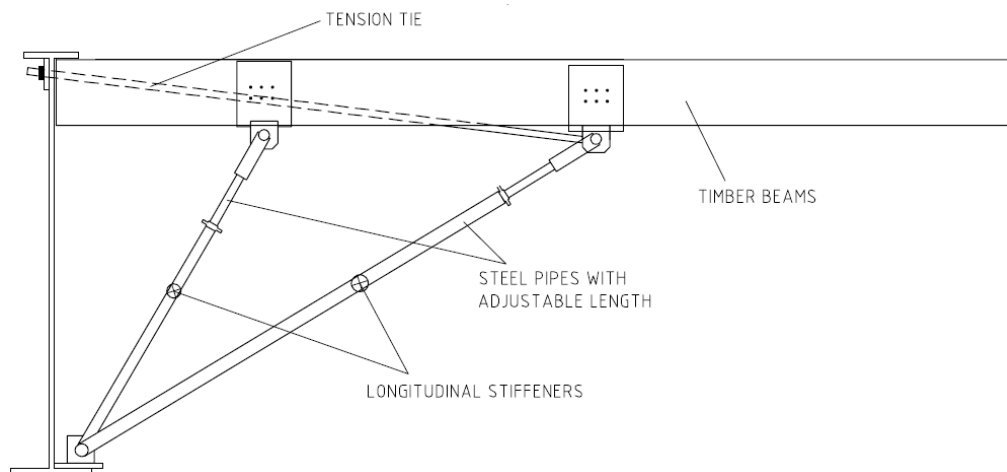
Cantilever formwork part with CUPLOK system (BRITEK Ltd)
